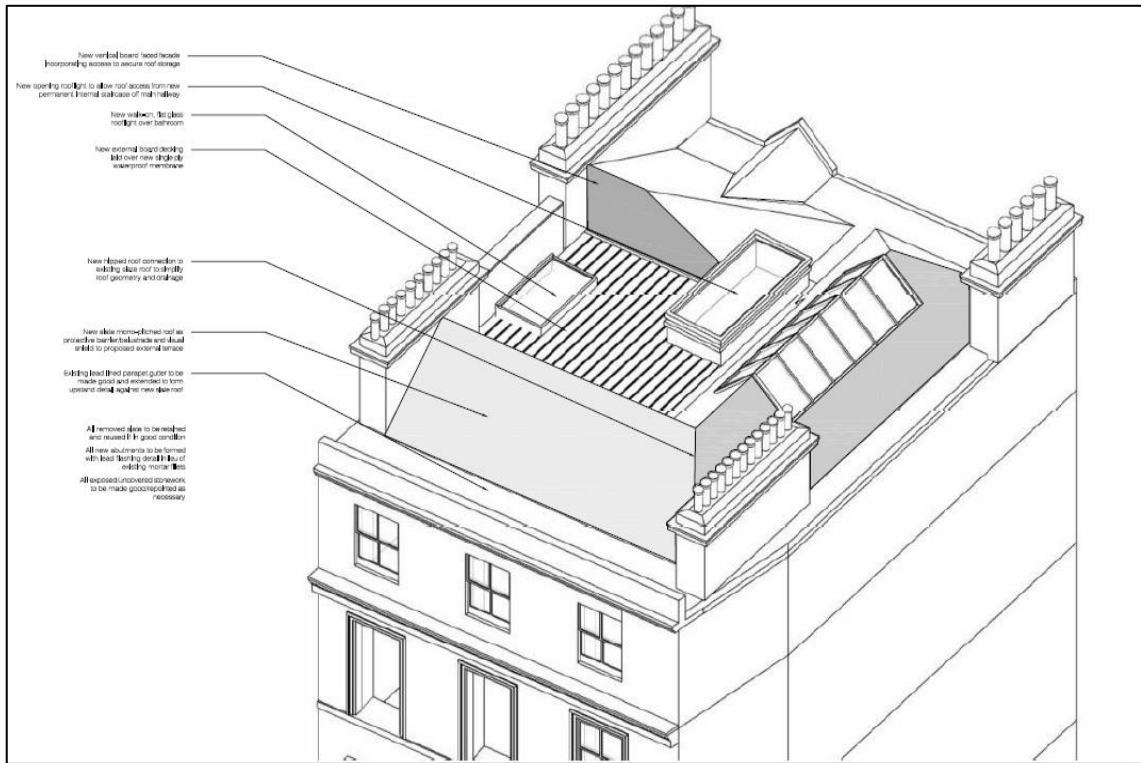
3D Visual of Proposed Rooftop (Richard Murphy Architects Drawing no. AL/02/02)
